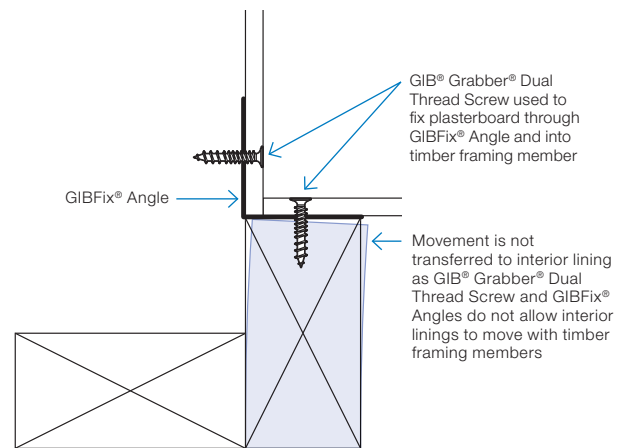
GIBFix® FRAMING WALL CORNER LAYOUT
